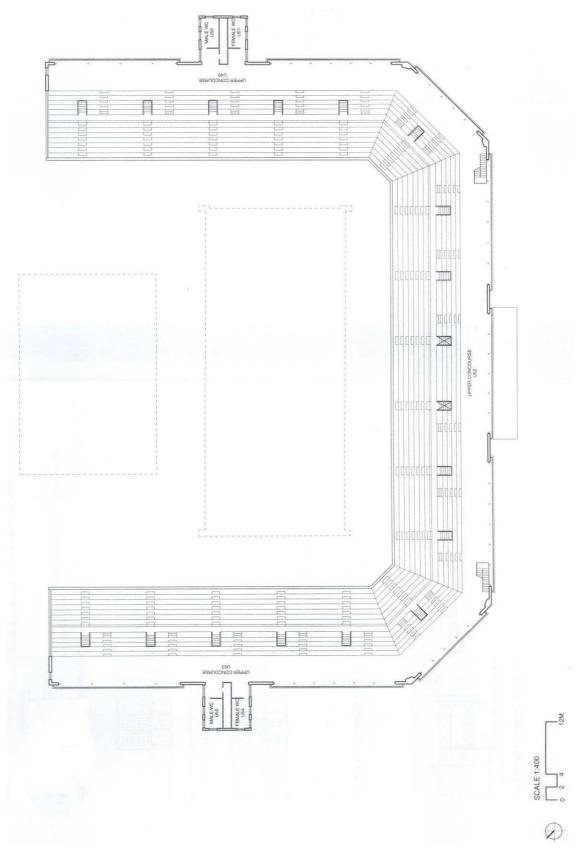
Beatty Park Leisure Centre – Upper Floor Plan.
